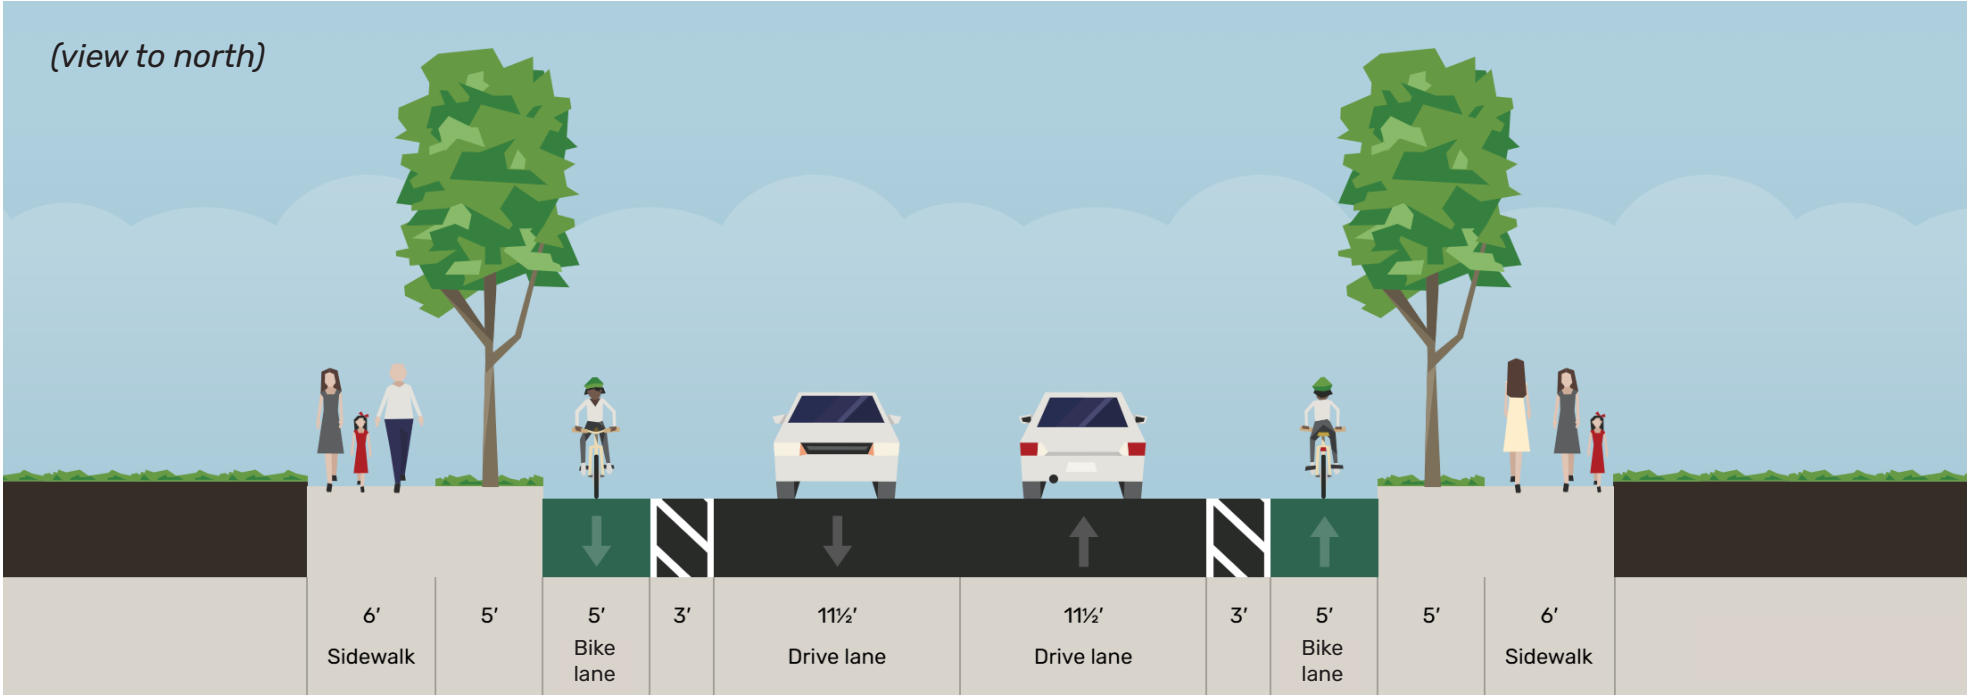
Proposed Typical Cross-Section on Garrison Road (South of Cliff Oaks Drive) (60' ROW)
